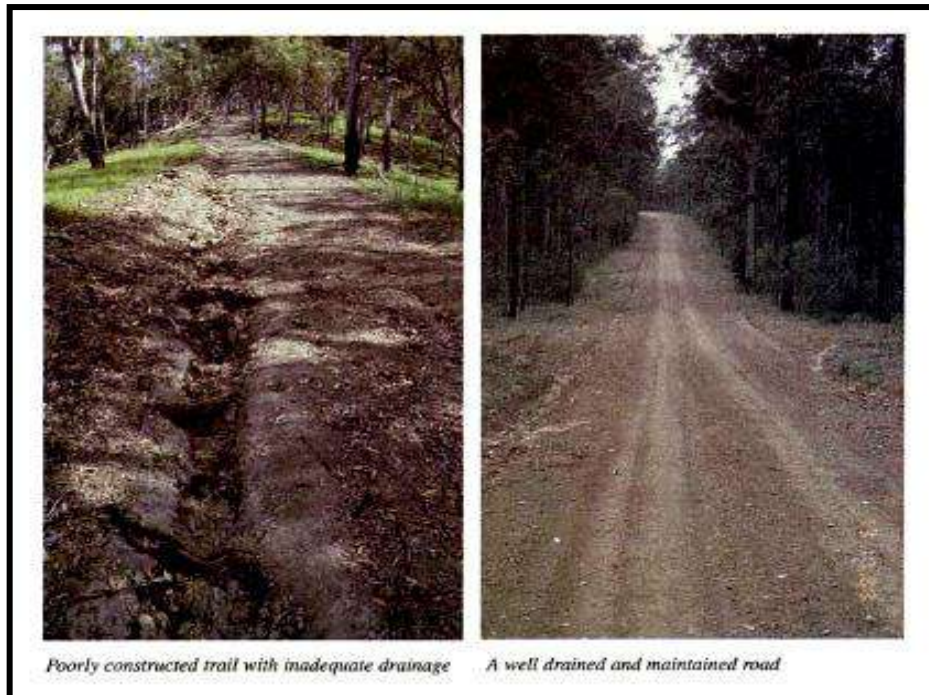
Example of Poorly Constructed Road and Well Drained and Maintained Road
